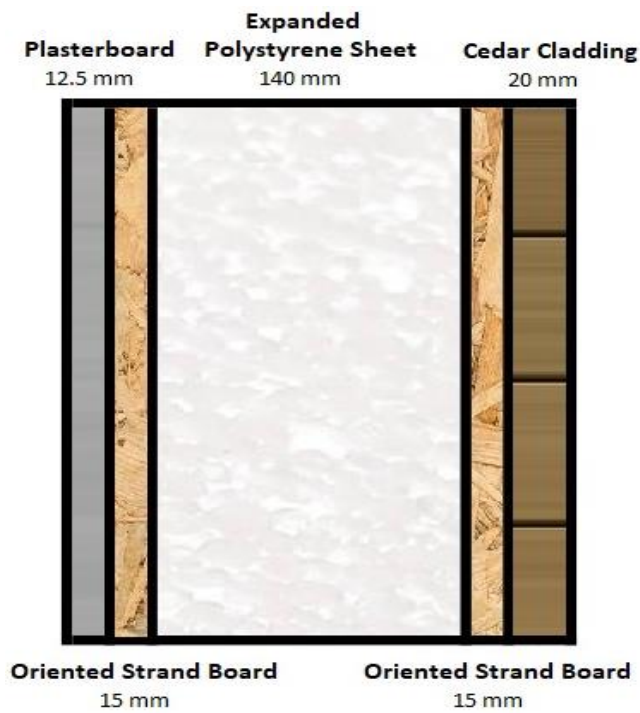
Cross section of the Structural insulated panels (SIPs)wall System
